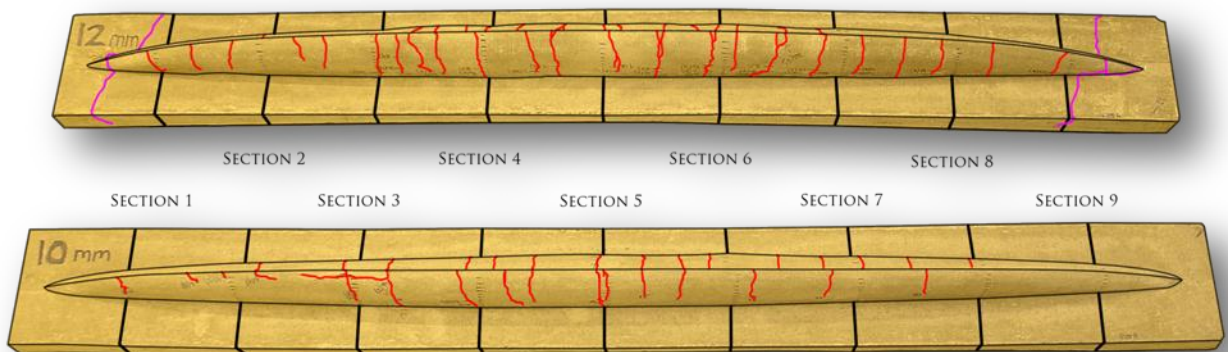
Crack pattern and failure mode (Lee/Pedreschi)
